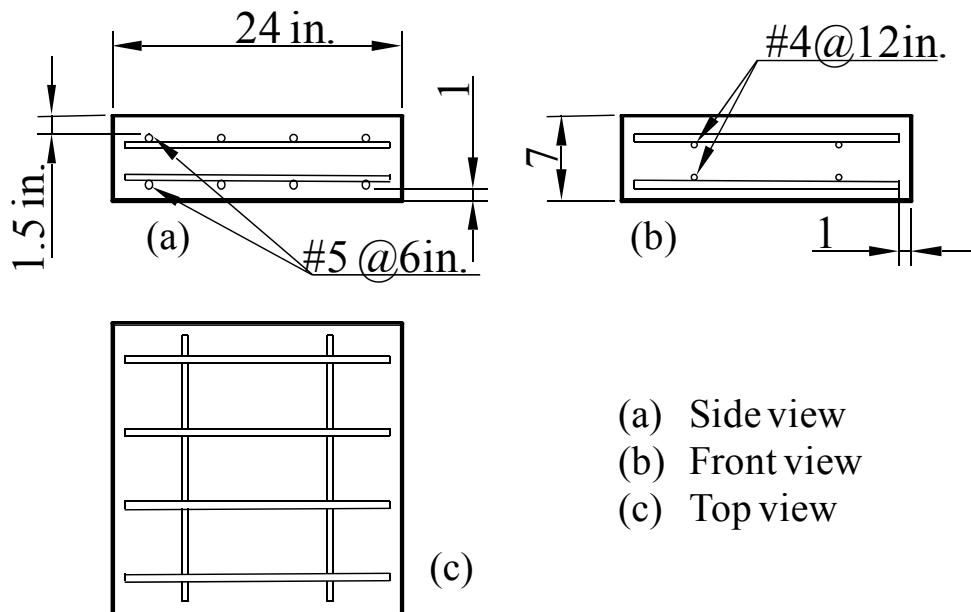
Reinforcing bar layout of single shear connector test specimens
